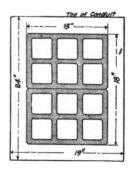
McRoy Tile, 11-Duct Conduit, Class "A" Construction.
